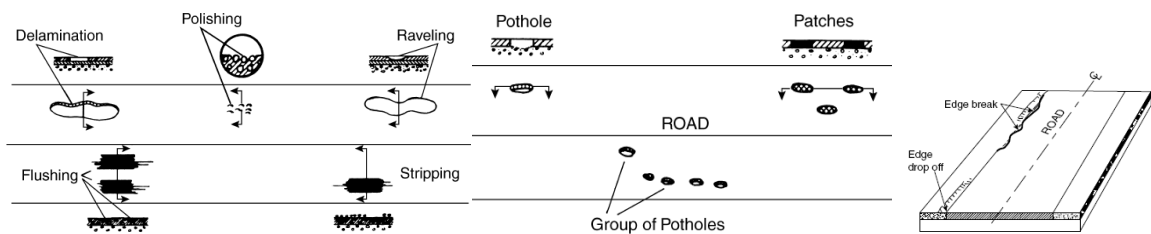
Sketch of surface defects in flexible pavement. (Austroad, 1987).
